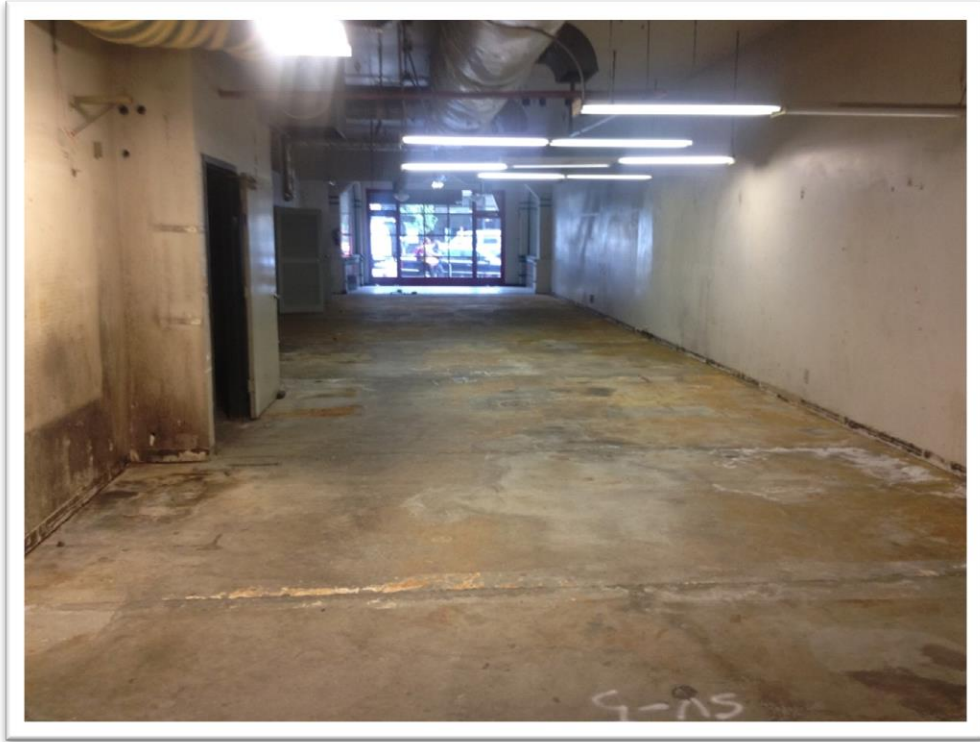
Former Red Hanger Cleaners (Rear of Suite, Looking Toward Front Door).
